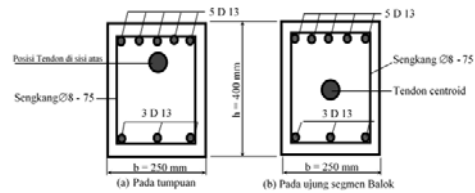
Concrete Beam Section of Partial prestressed Flexural beam load capacity
